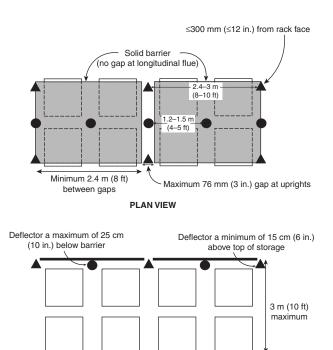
(c) Double-Row Rack Sprinkler Layout for Design Scheme A.
